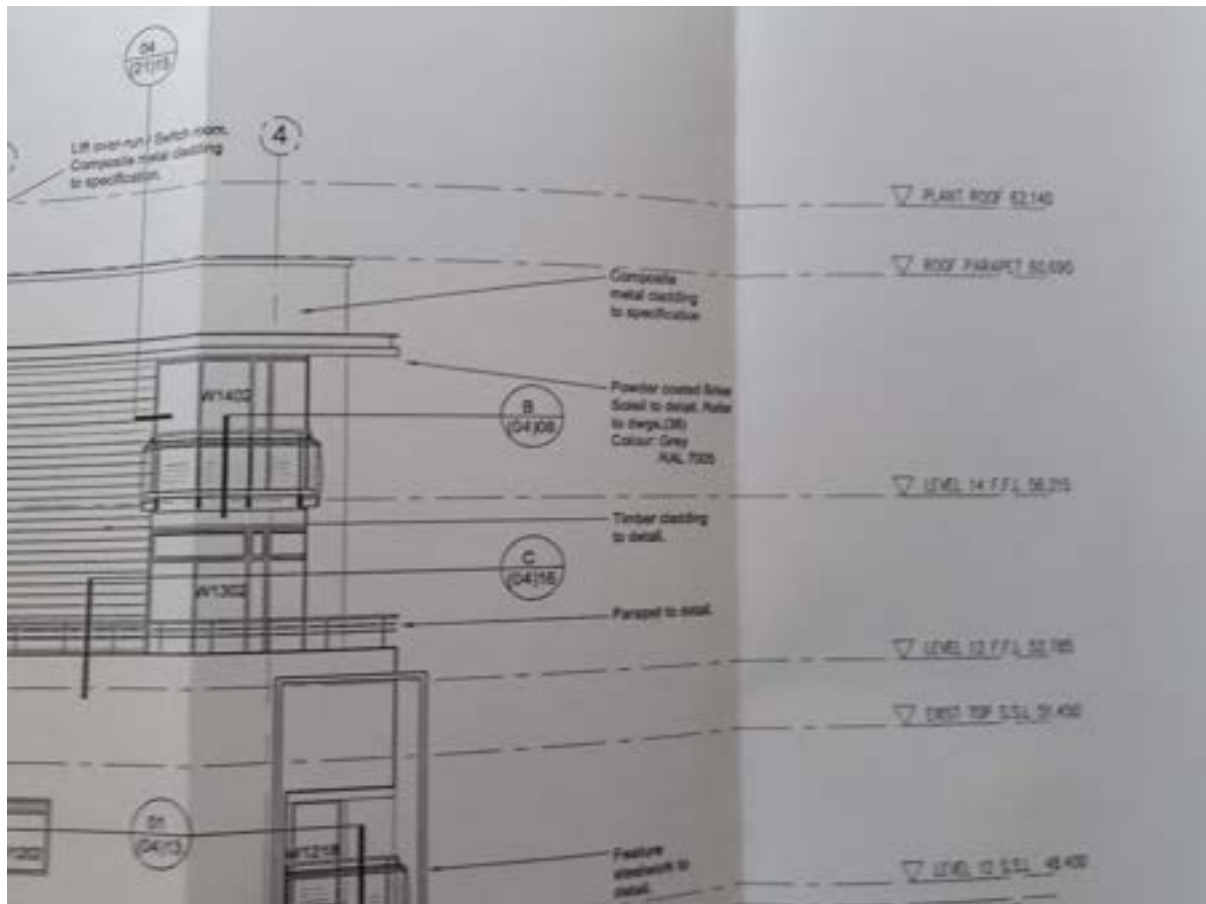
Elevation drawing showing location of metal cladding to plant room on roof.
